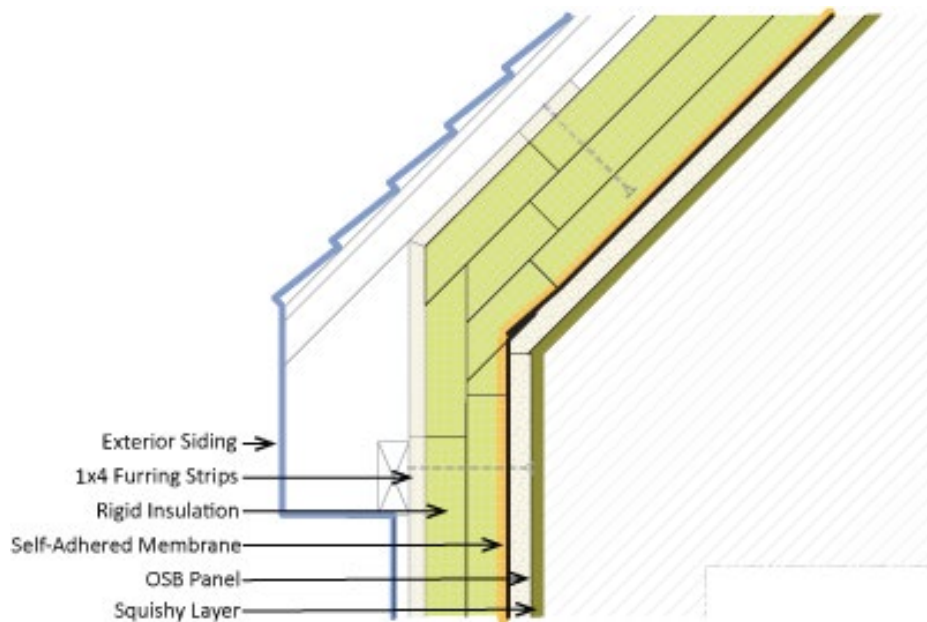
Sloped Roof Application with Roof Panel – Assembled Section View
